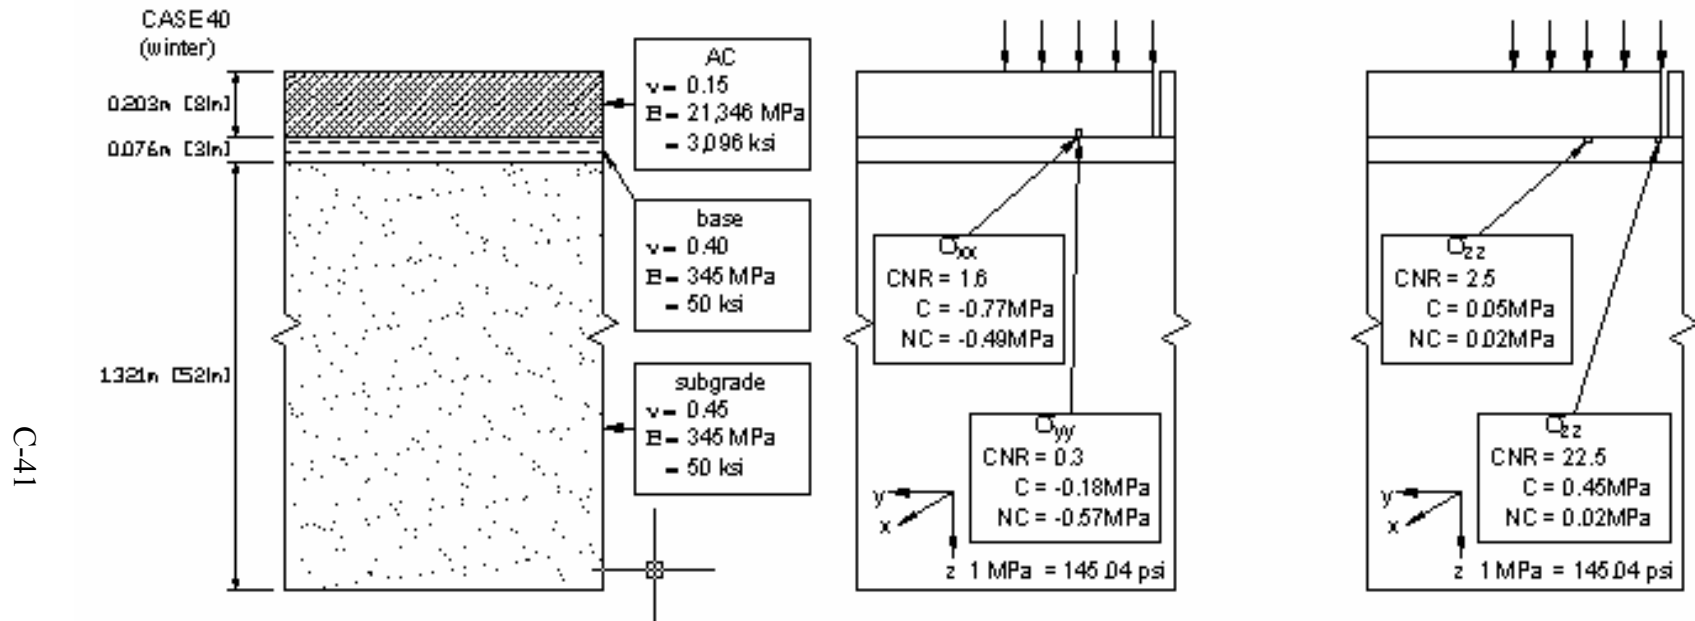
Summary cross section for case 40, (C – stress in cracked pavement, NC – stress in pavement with no crack, CNR – crack/no crack (stress) ratio)
